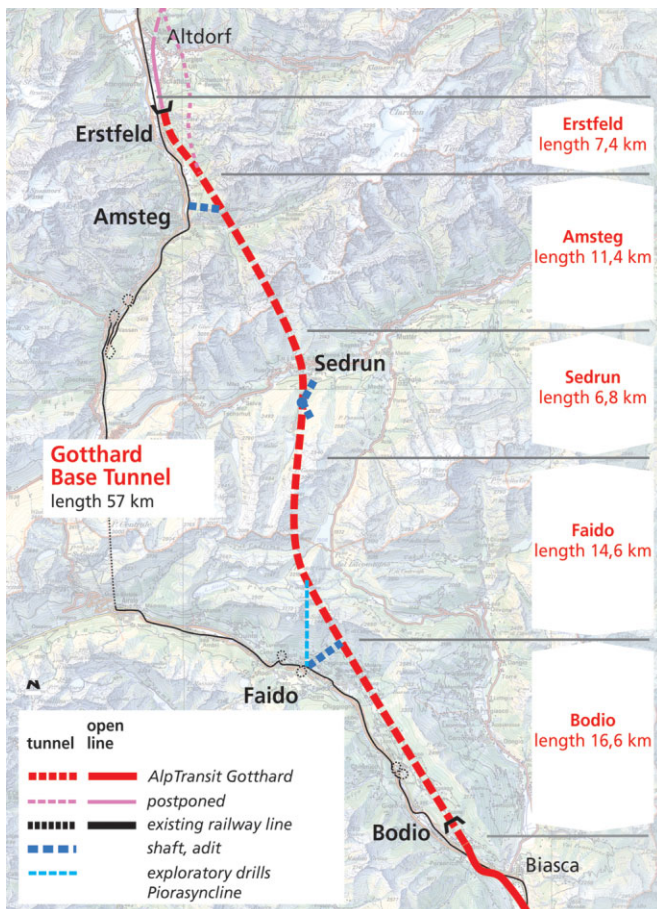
Alignment of the Gotthard Base Tunnel with construction sections
